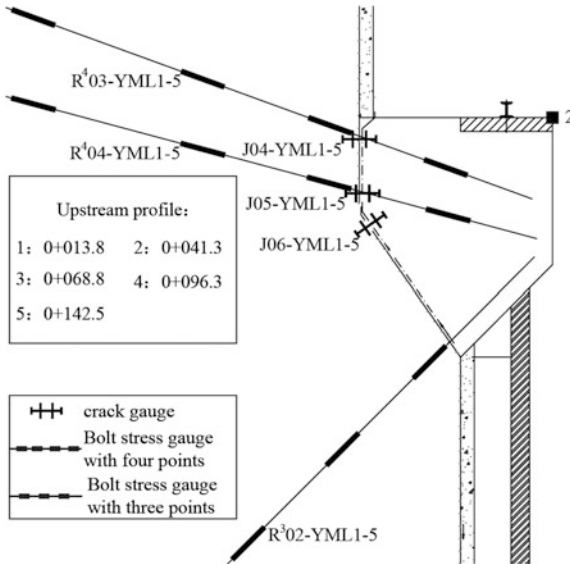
Layout of monitoring instruments on the rock-anchored beam
